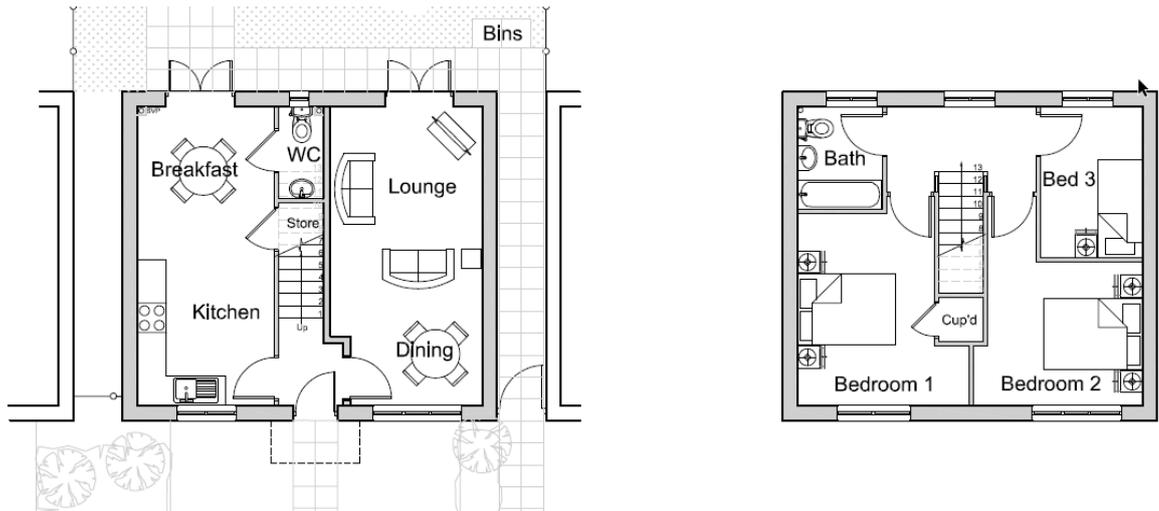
Indicative Proposed Plans and Elevations of the Proposed Dwellings
